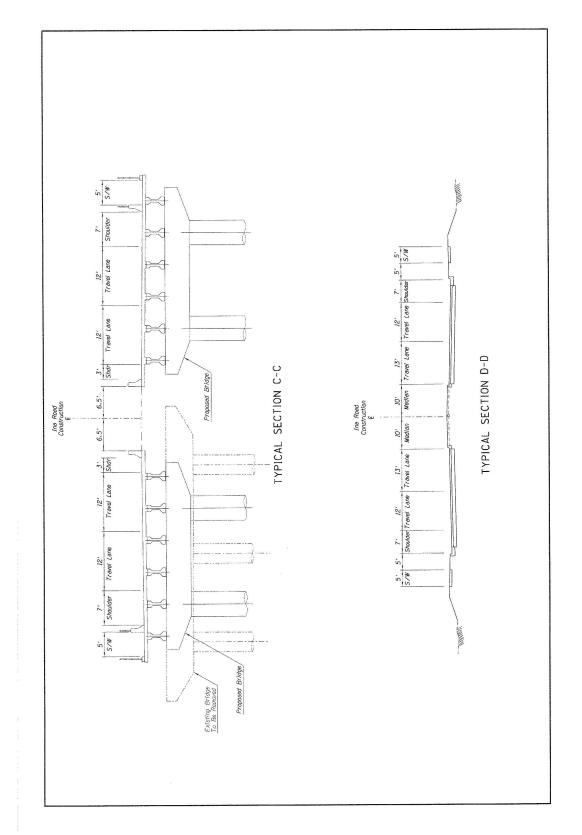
Town of Marana Ina Road project typical sections for bridges at Santa Cruz River (C-C) and Ina Road west of Santa Cruz River (D-D)
